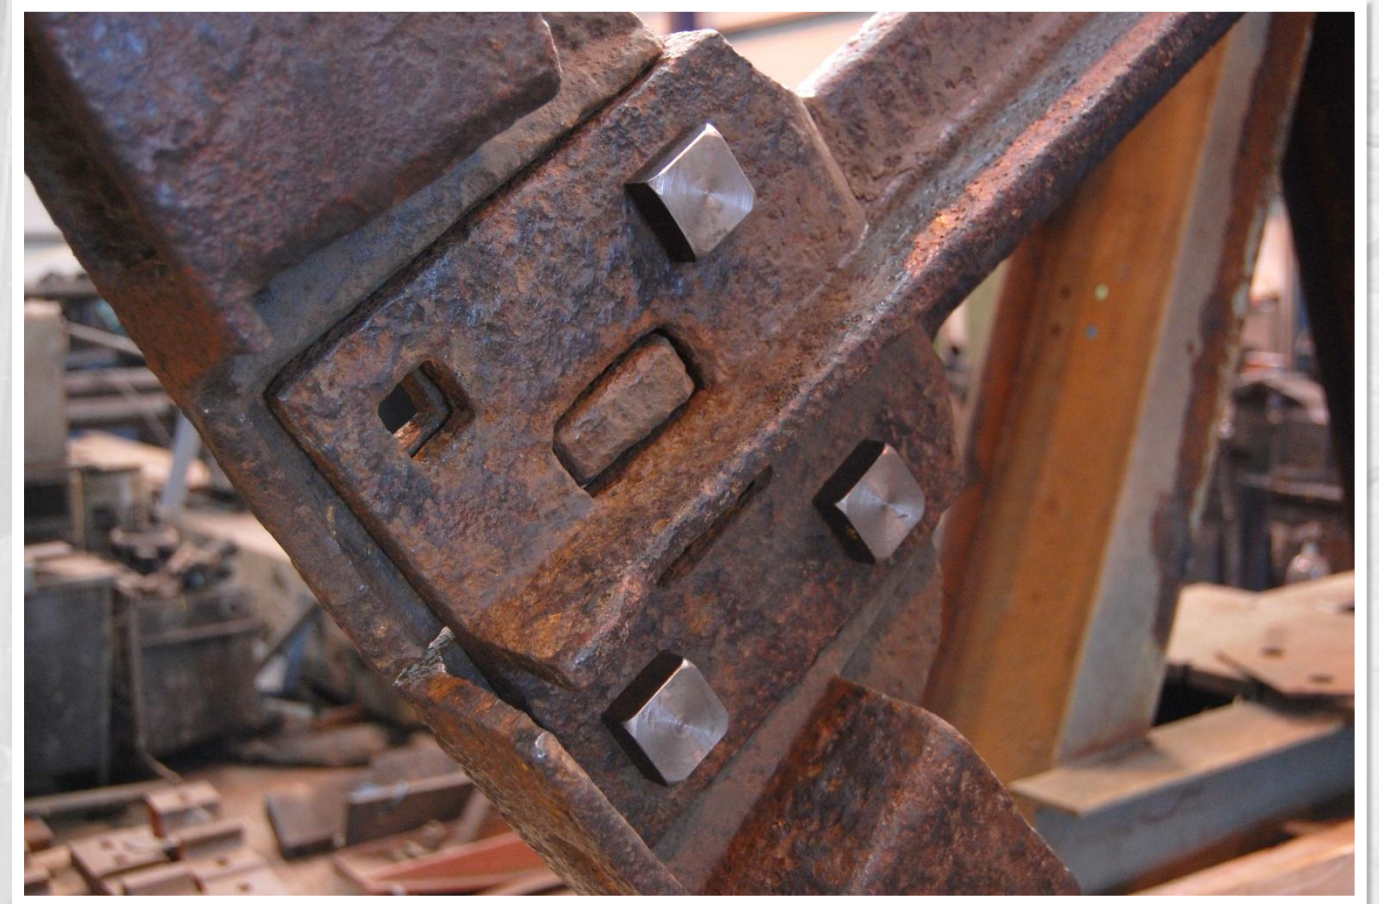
03/09/2010 Enlarged view showing replacement square-head bolts.
